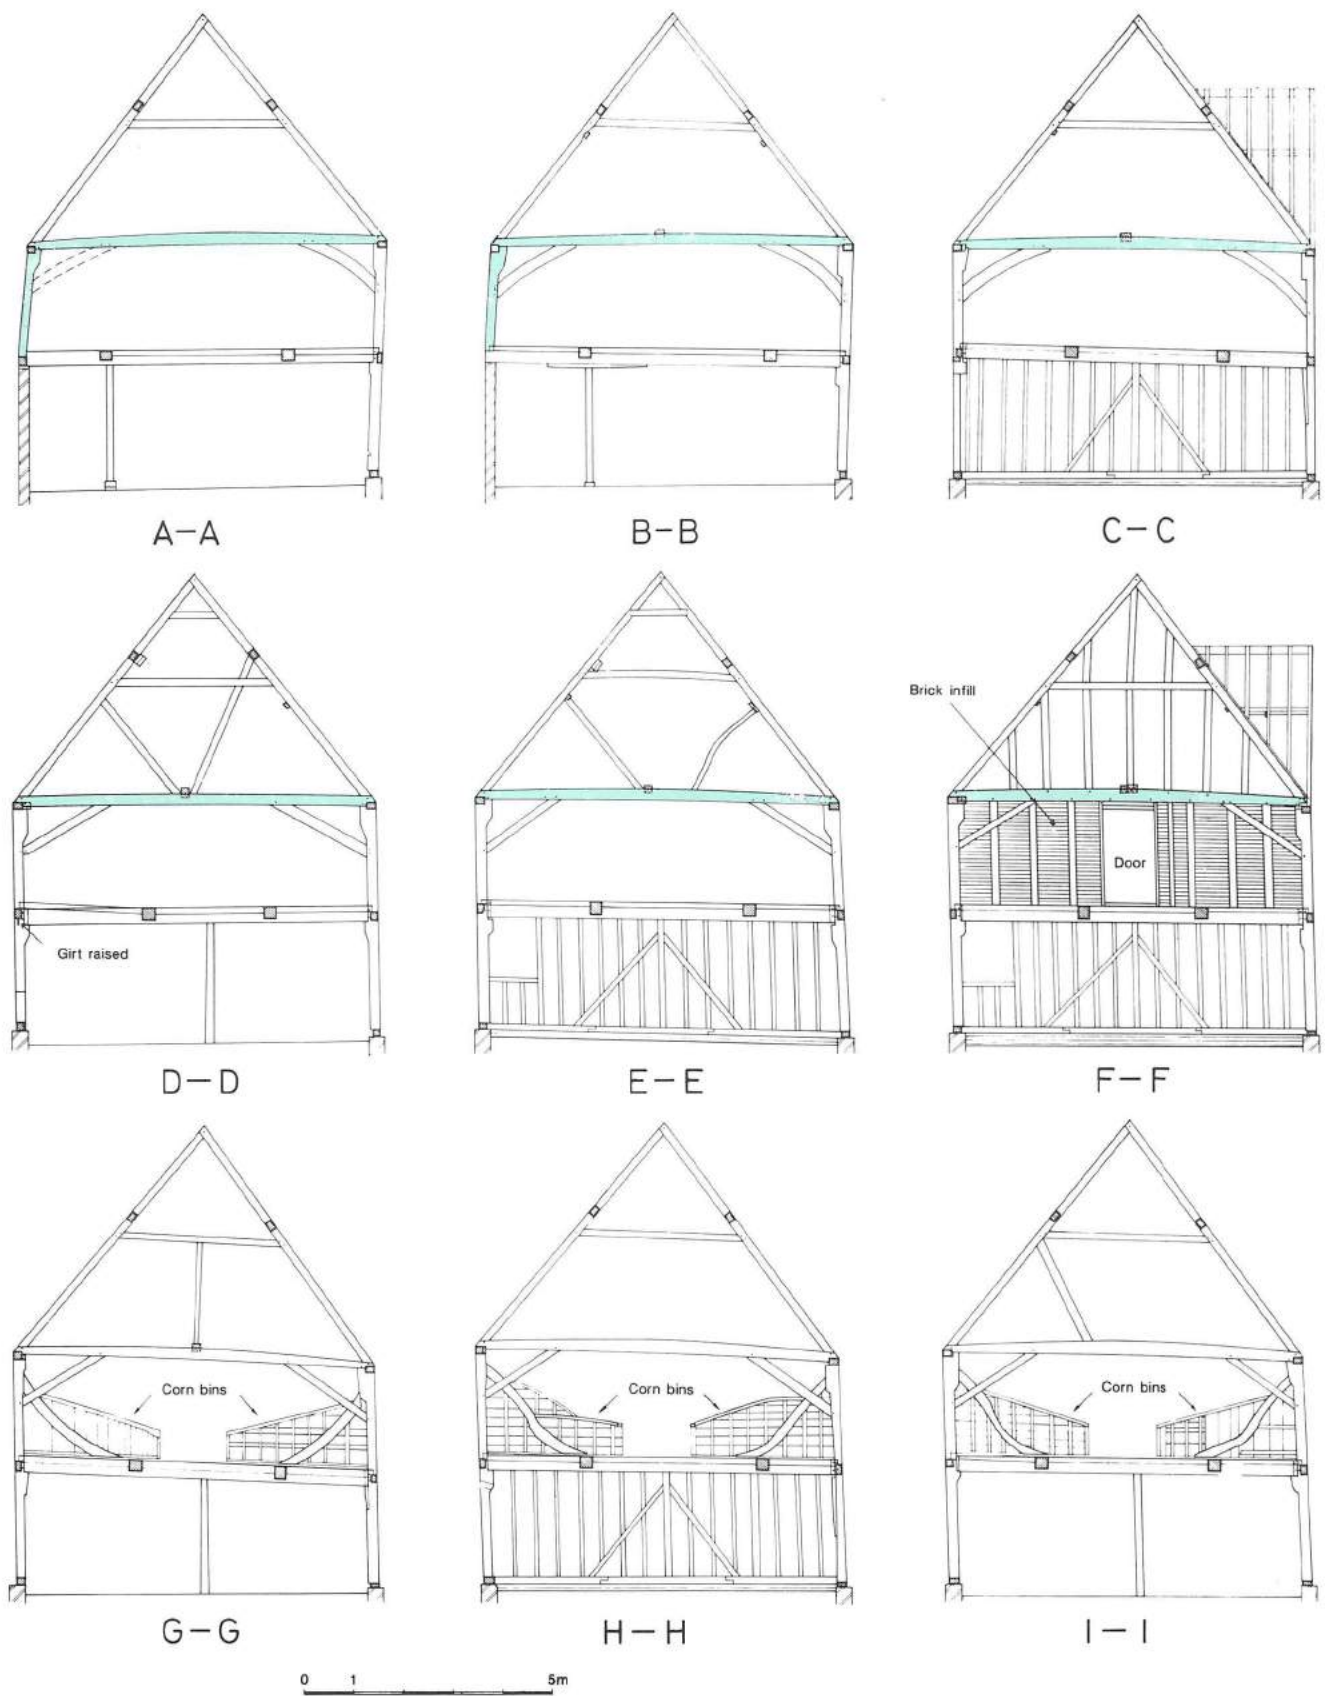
The Granary, sections taken at principal trusses (re-used timbers original to the 1623 construction shaded).
